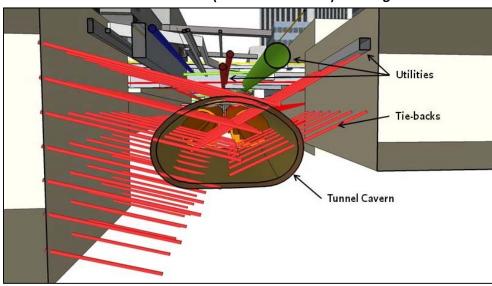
Flower Street Segment Cross Section at Tunnel Cavern before Transition to Twin Tunnels (South of 5th Street) showing Tie-backs
